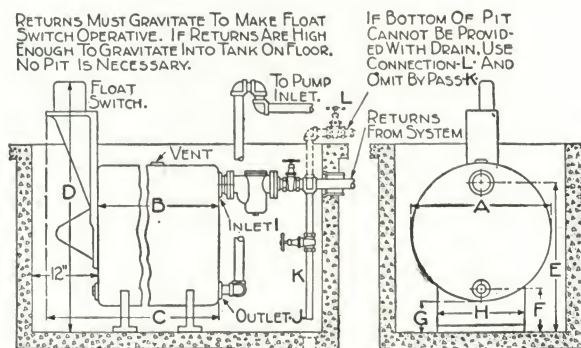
Roughing-in Dimensions, Accumulator Tank
